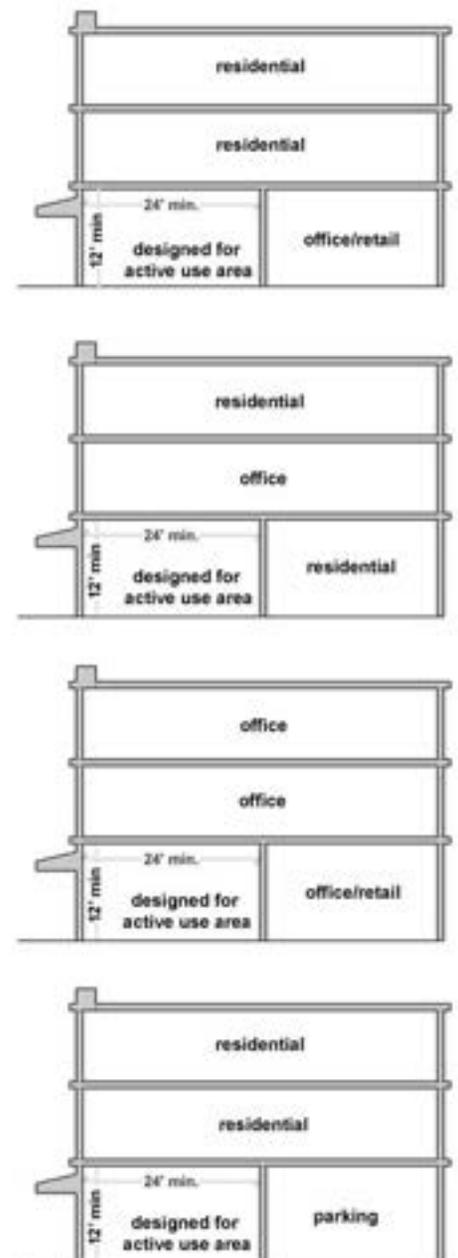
Showing required active use area along an active edge with possible mixed use building use combinations.
